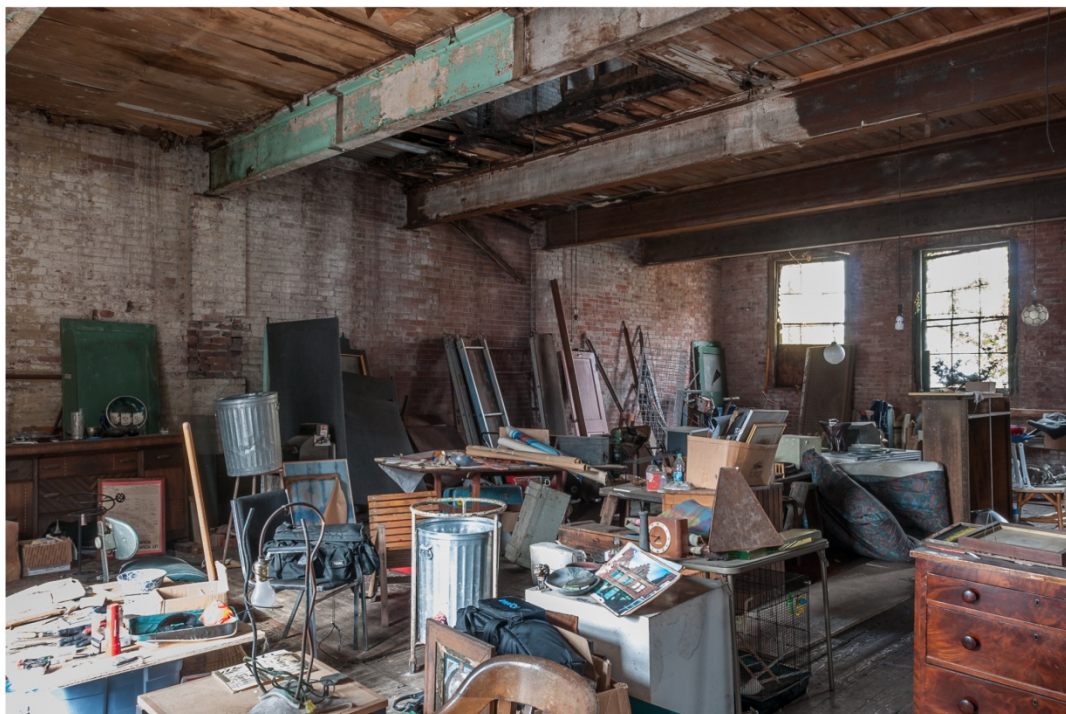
Mansuy and Smith Automobile Showroom Building, first story, view northwest showing open interior and steel beams.
